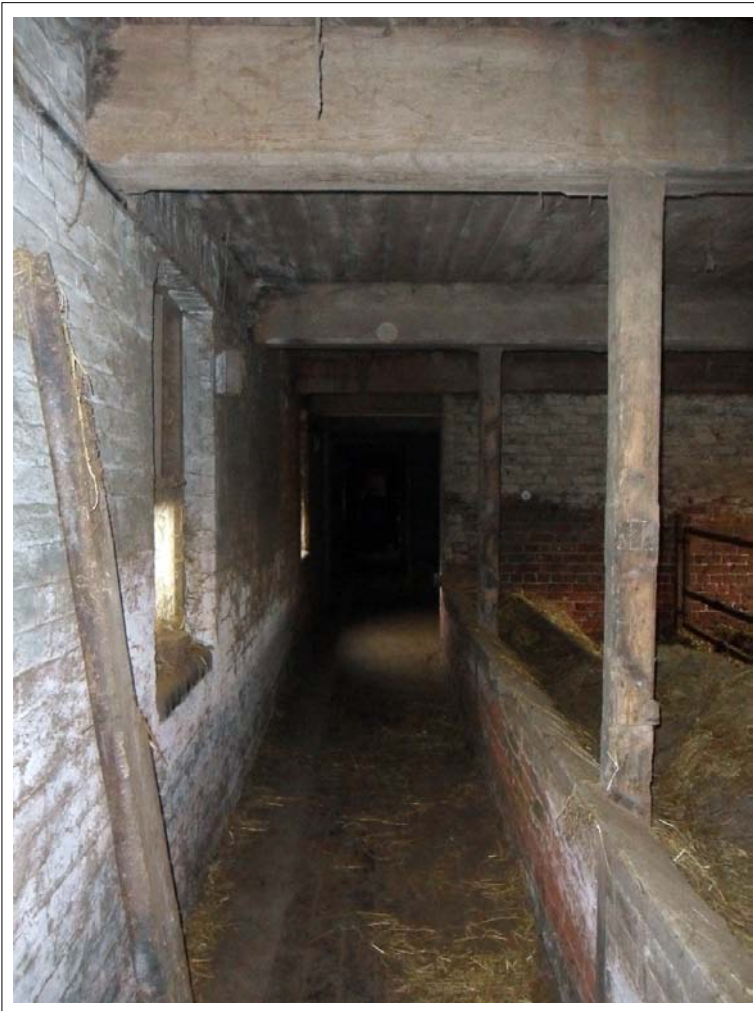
View south west down corridor adjoining animal pens in animal range 2
